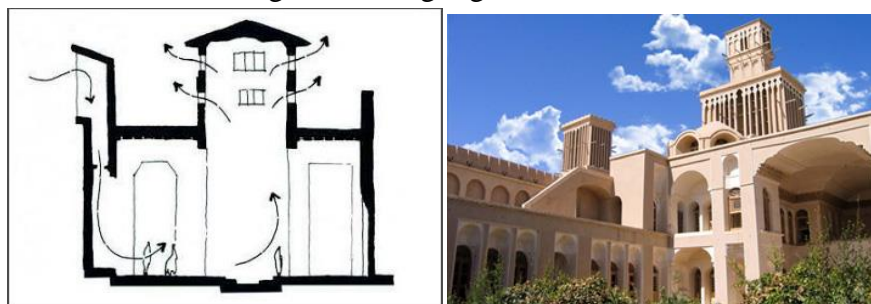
Section of a typical windcatcher and an example in Aghazadeh Mansion. Abrkouh. Iran
